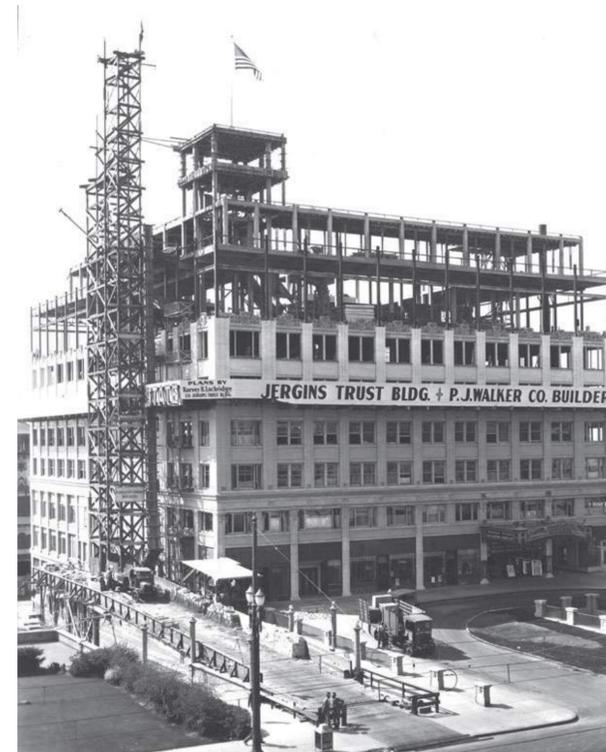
Additional floors being added, ca. 1928. Source: Los Angeles Public Library.
